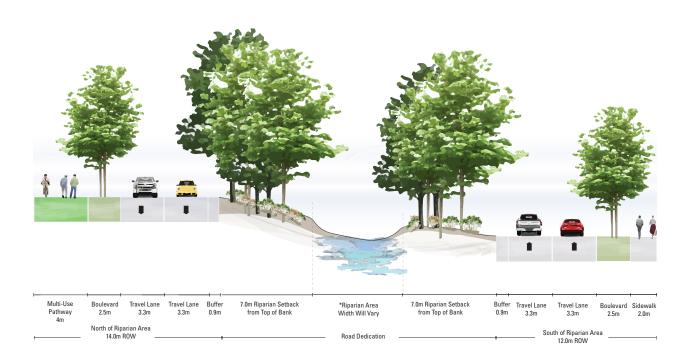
K: 18 Avenue Grand Boulevard Cross Section
